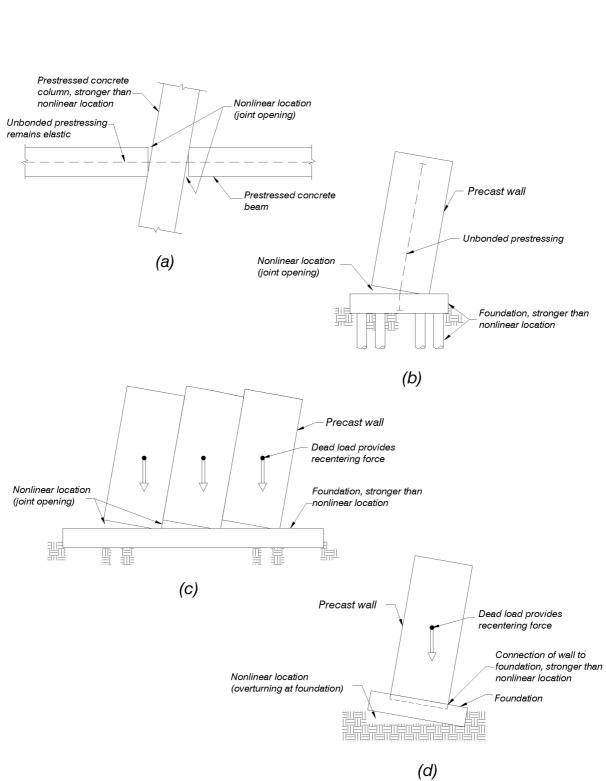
Examples of jointed rotating precast systems: (a) moment resisting frame, (b) wall with unbonded prestressing, (c) walls rocking at base of wall, and (d) wall rocking at base of foundation
